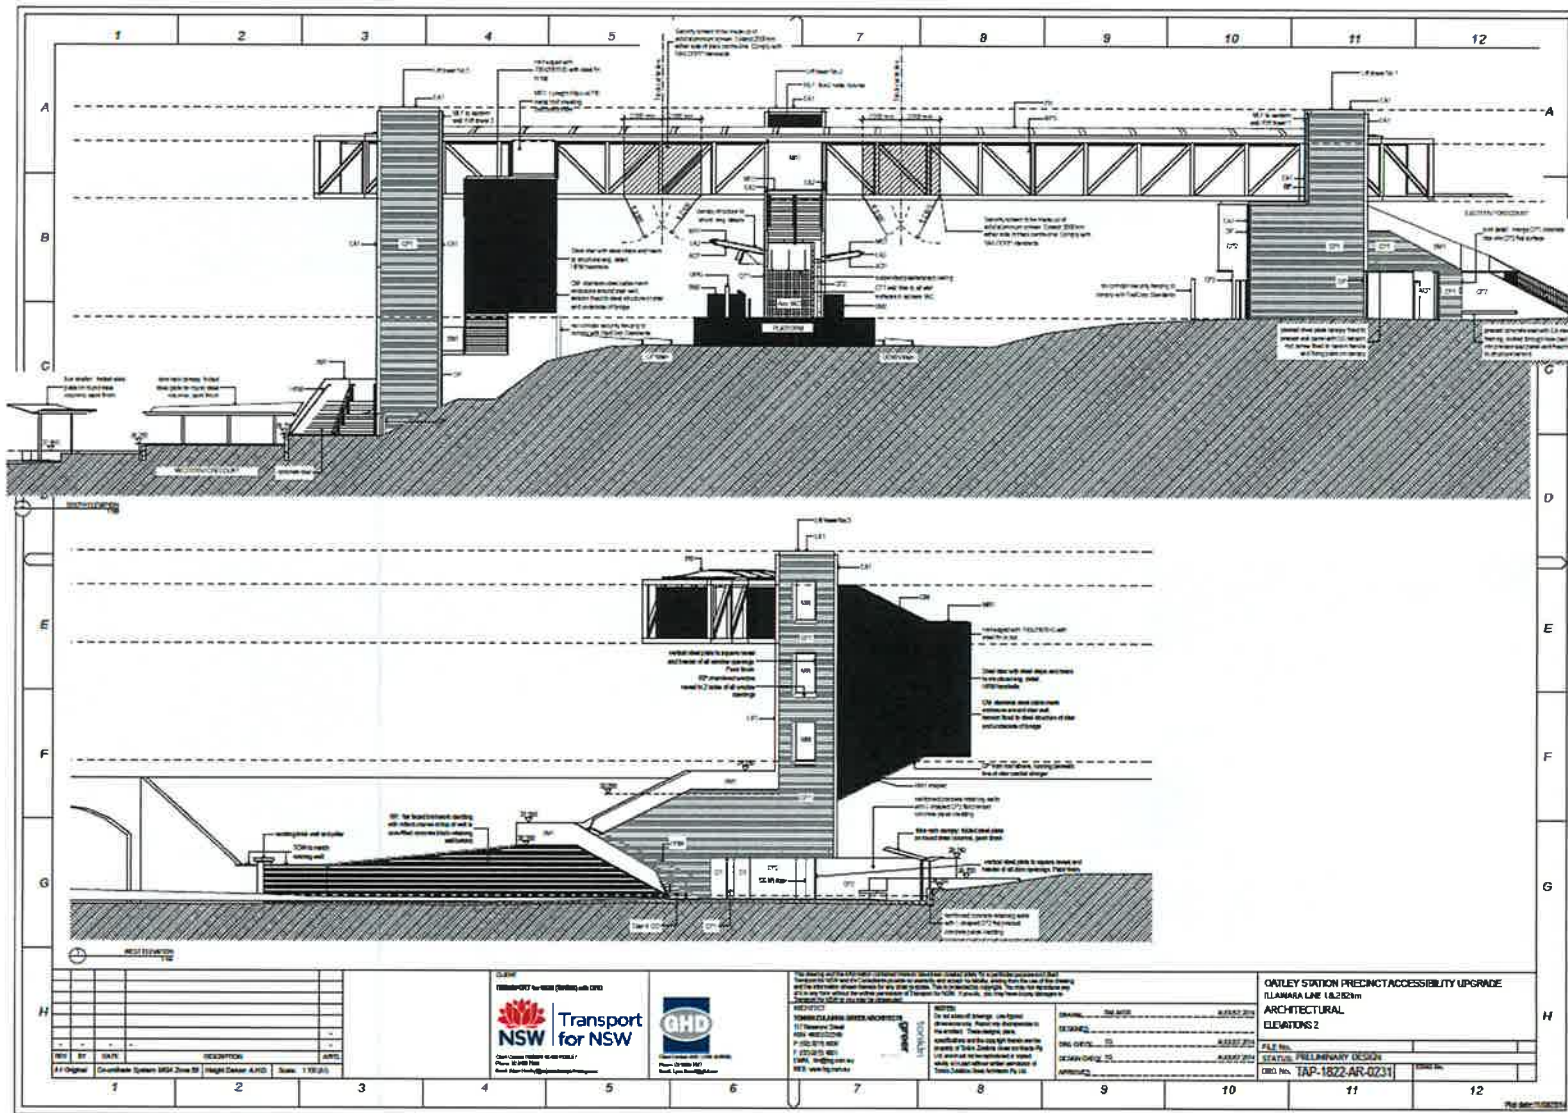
Proposed north and east elevations of Oatley Station, showing existing and proposed elements.
